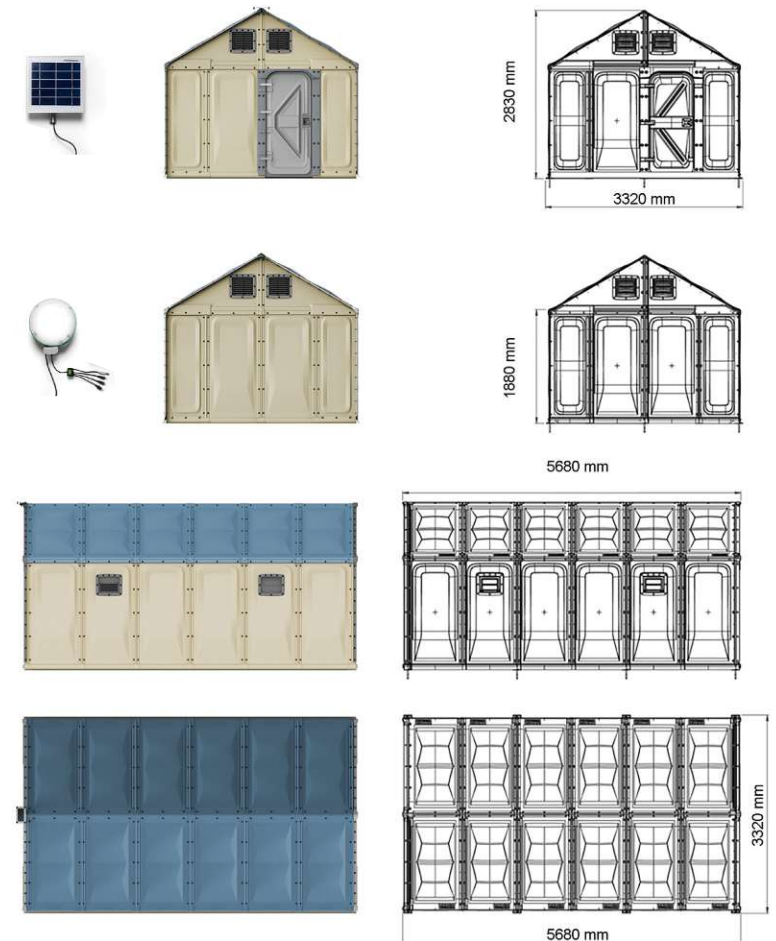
Lamp, solar panel and elevations, BetterShelter.org, 2018
